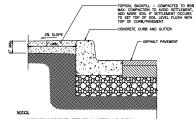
PLANTING BED EDGE DETAIL
